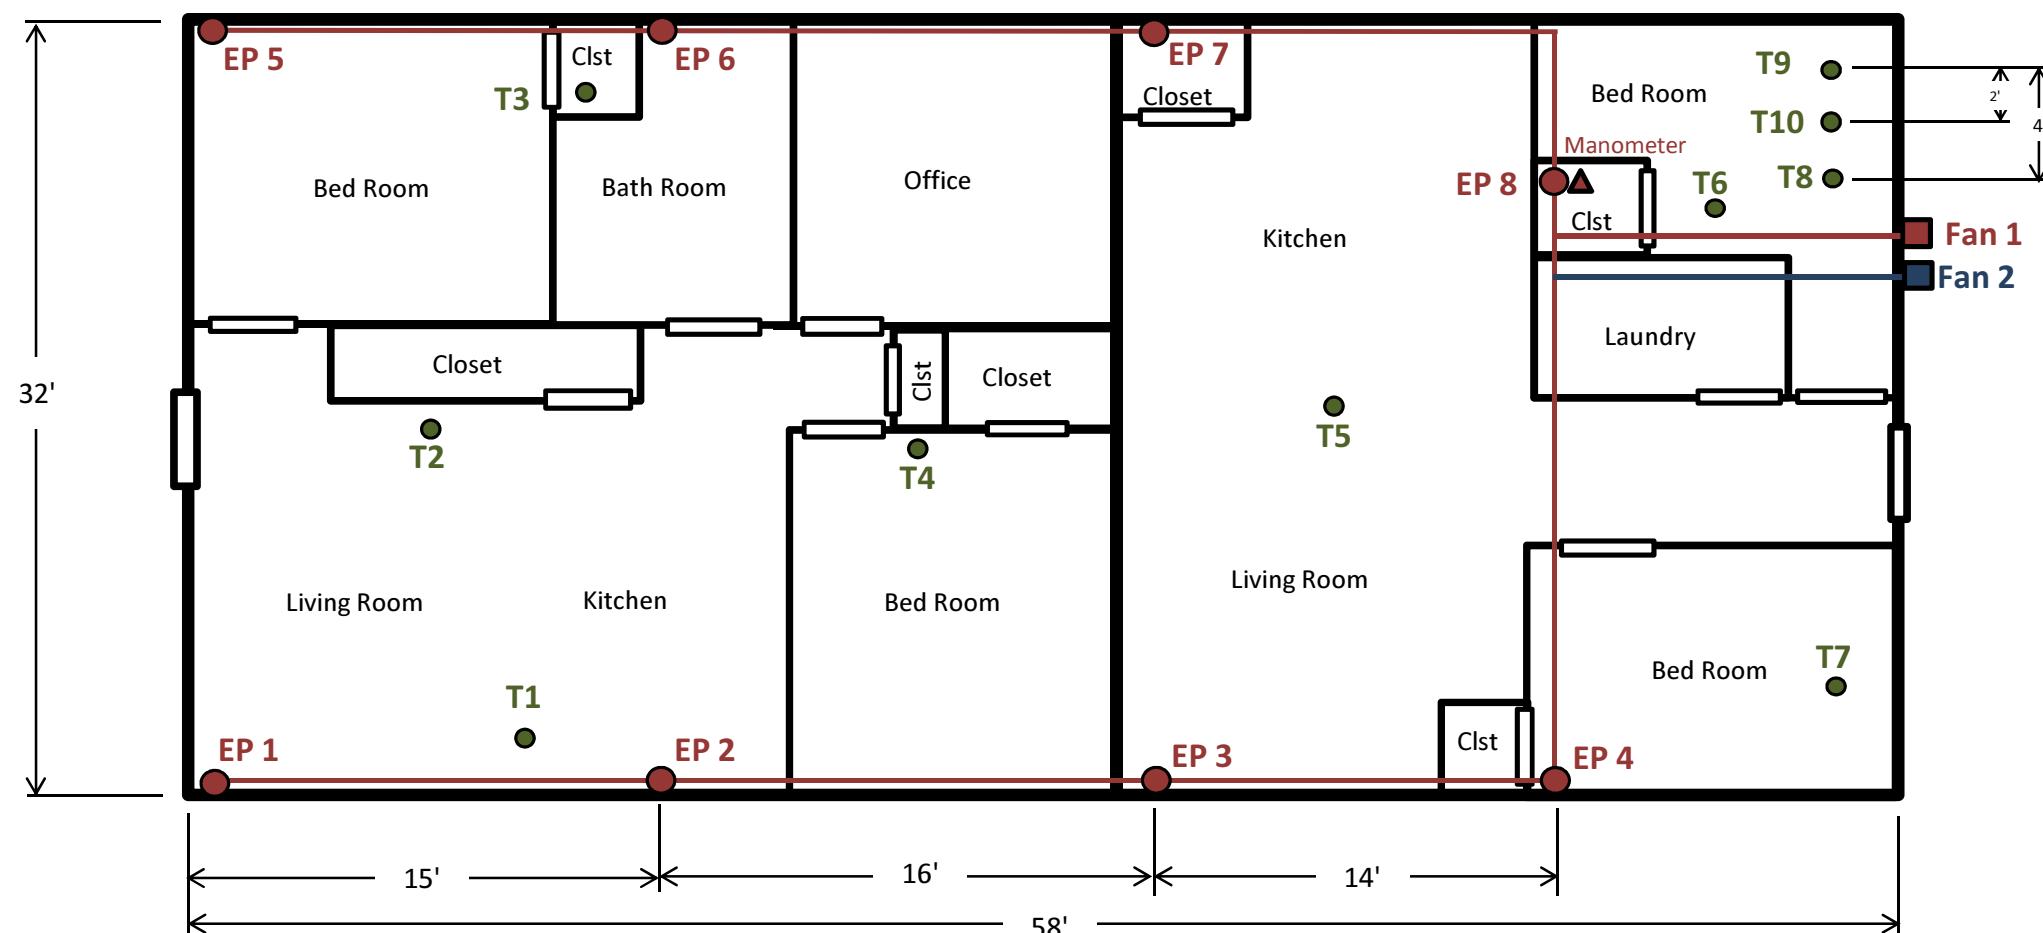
Subject Building: 325-327 Park Avenue,
